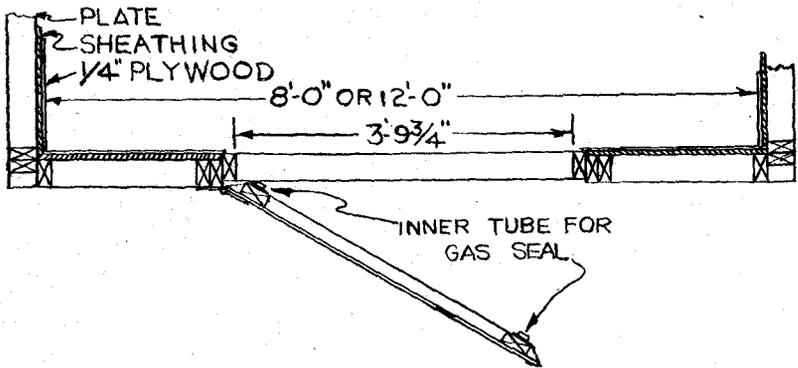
Construction details of door (plan view). Rubber stretches around jamb when door is closed to form gas-tight seal at top and both sides of door.
